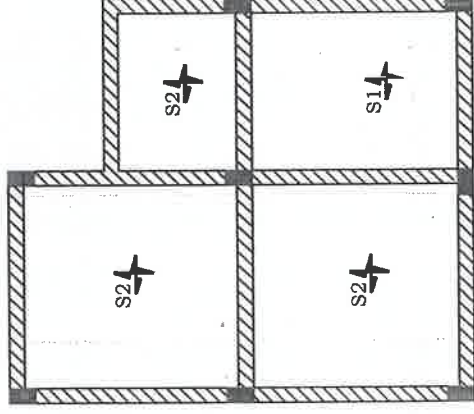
DETAILS OF REINFORCEMENT IN SLAB BEAM :-
